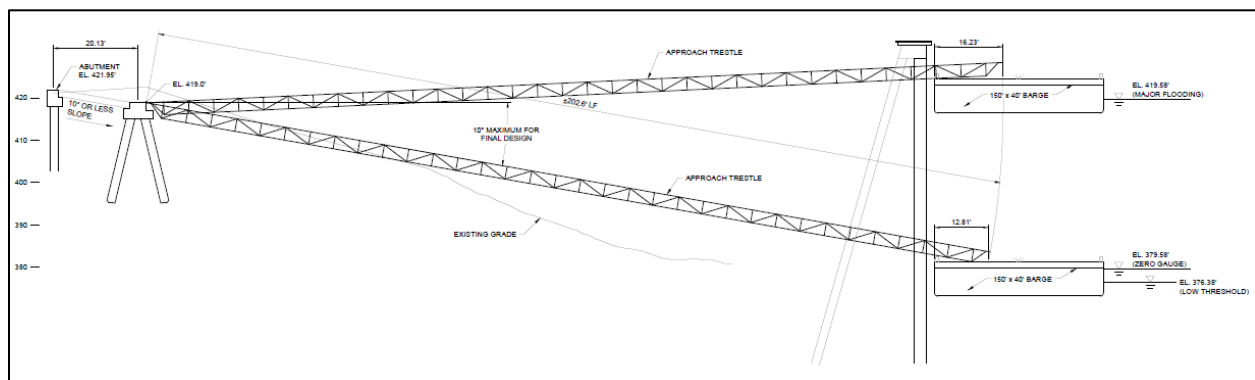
Arsenal Street Alternative- Fixed Trestle Profile View
